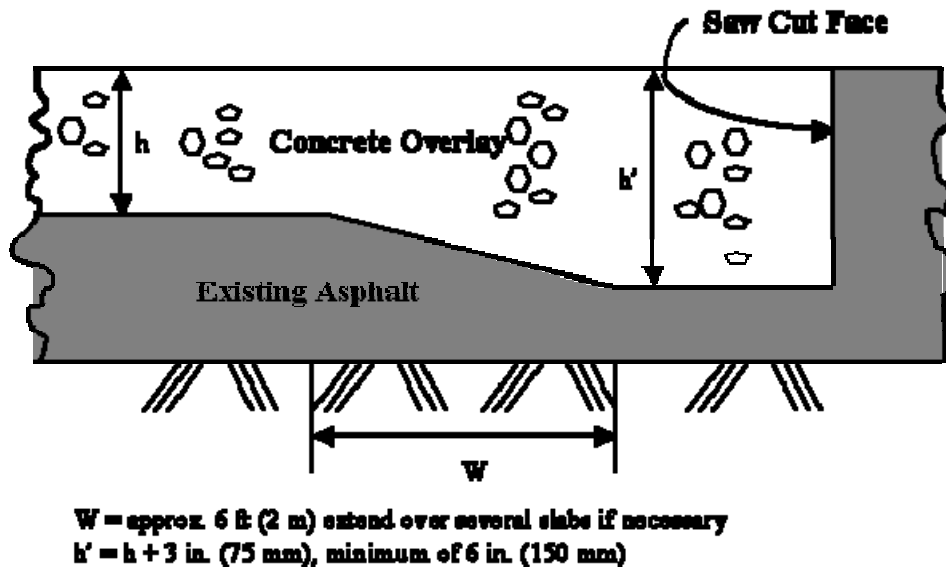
Transition Between UTW and Adjoining Asphalt Pavement (ACPA, 1998).
